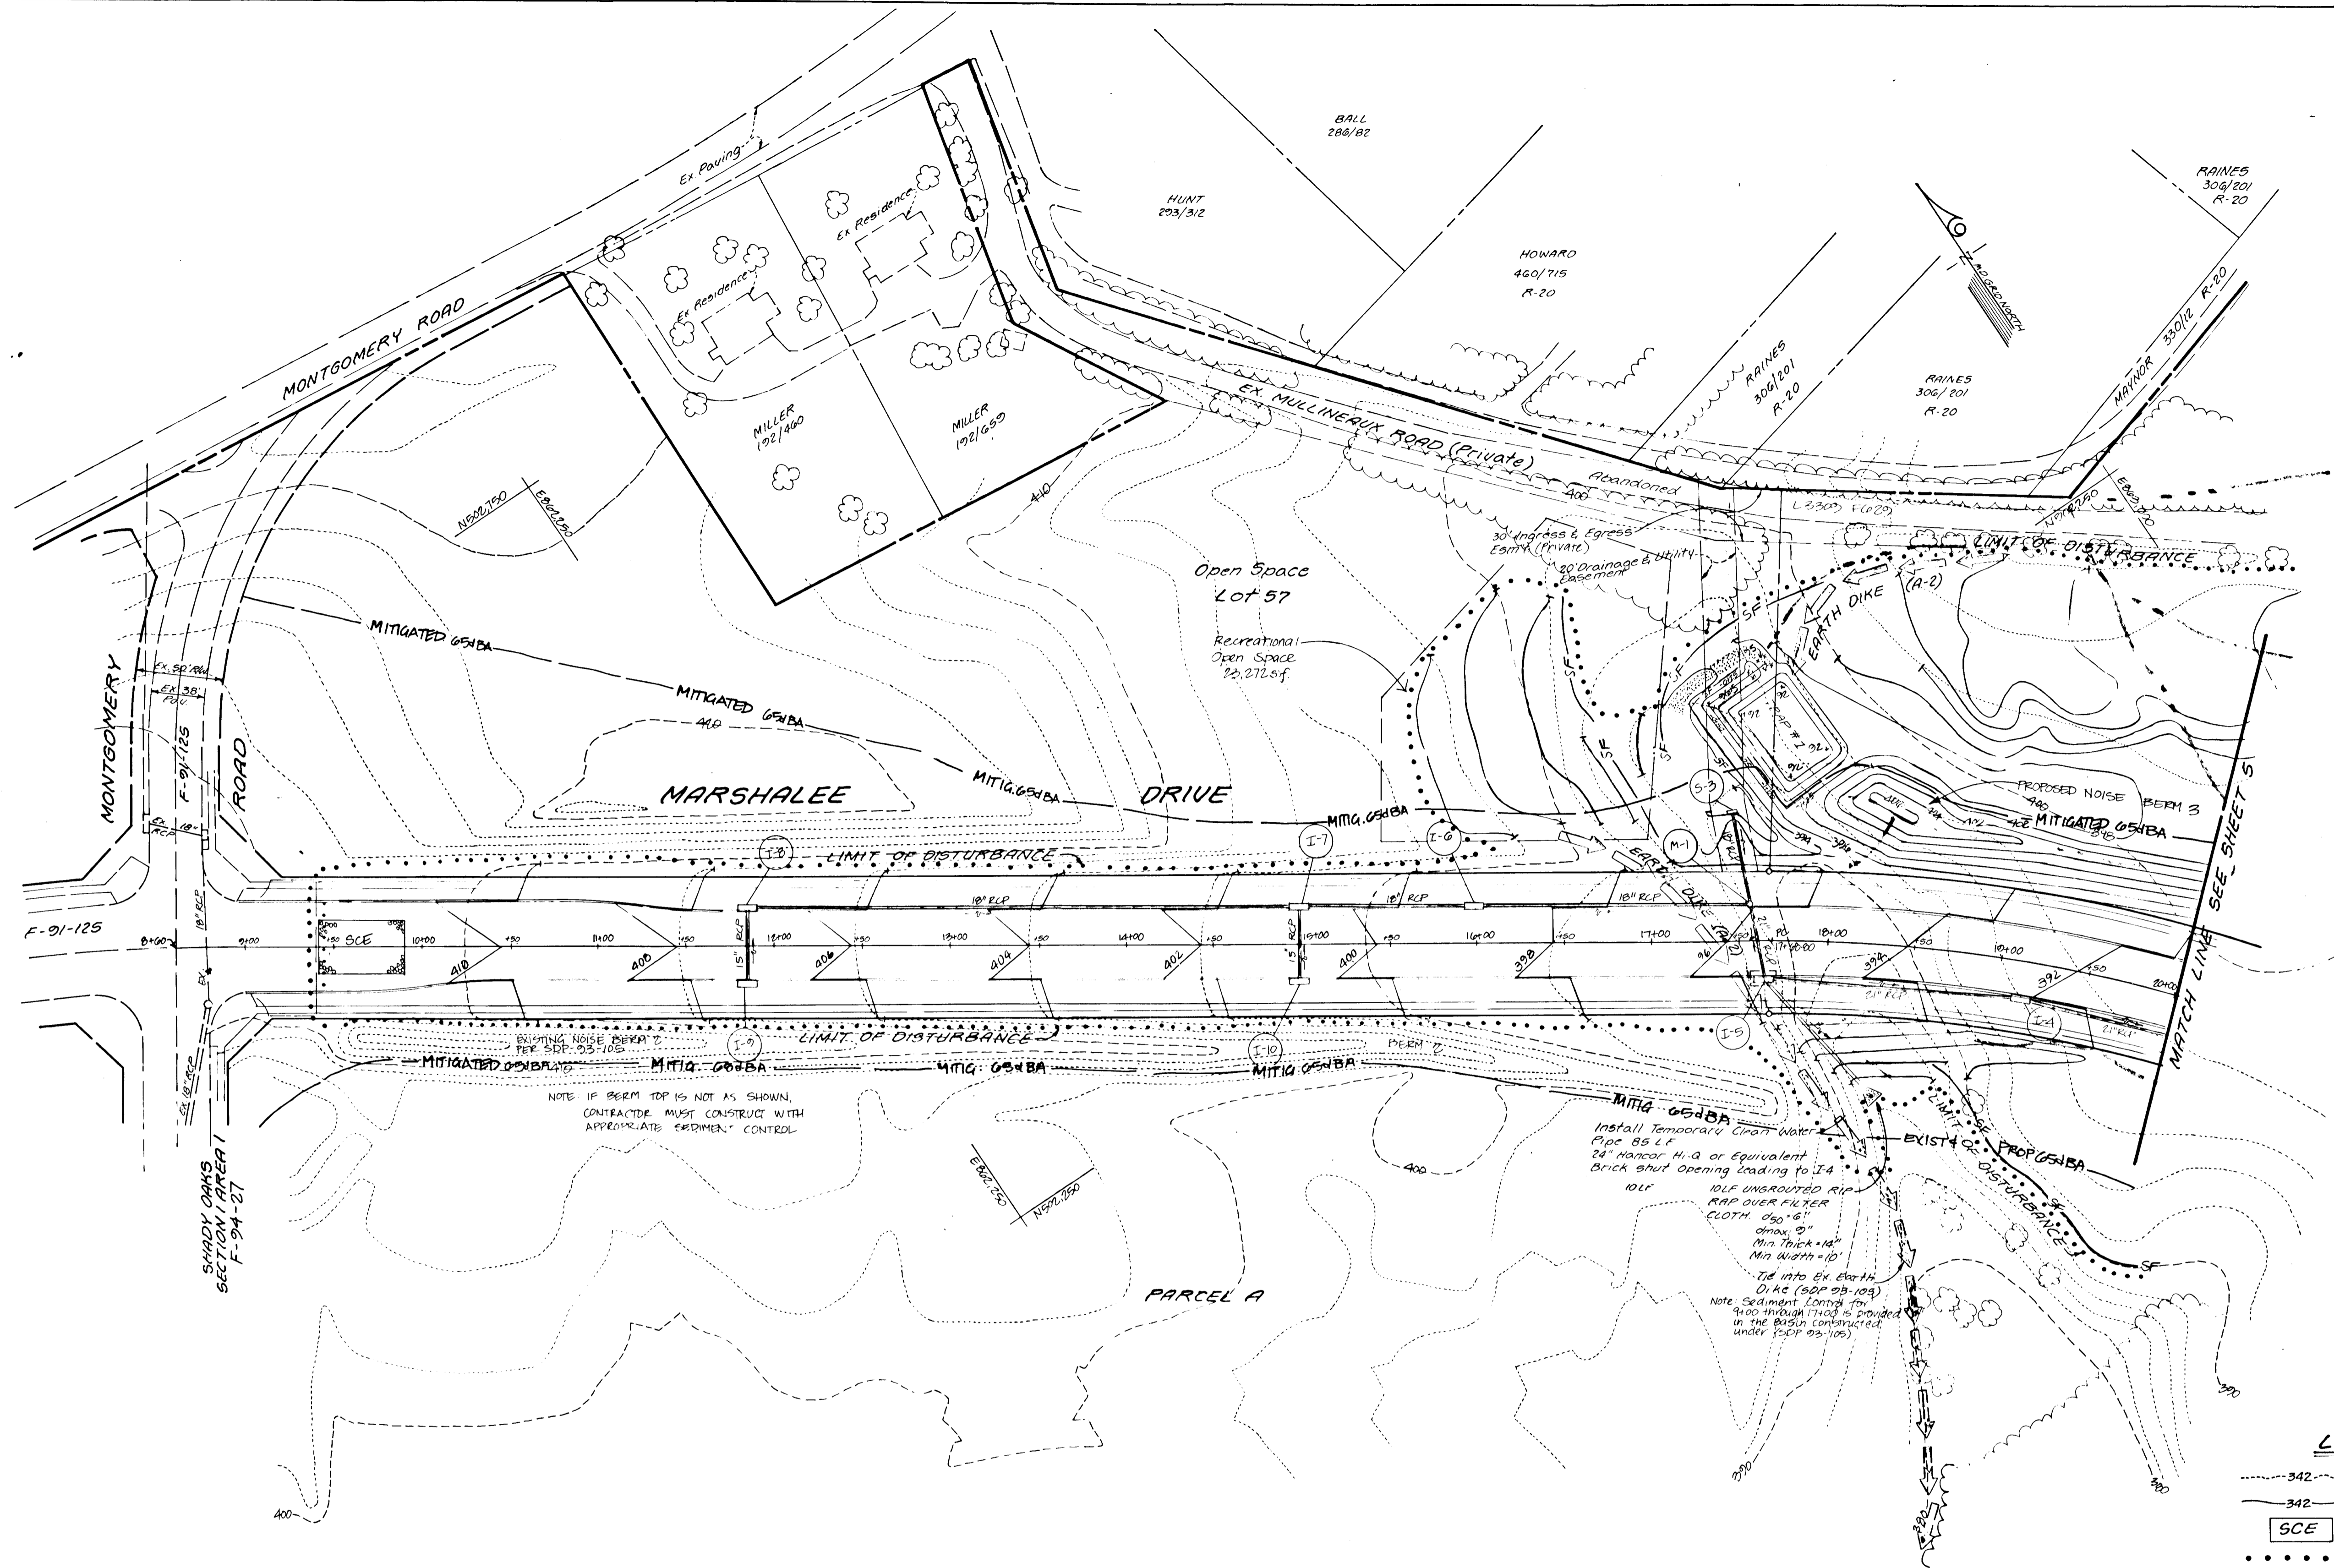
SINGLE PLAN AND PROFILE-FULL LINE
